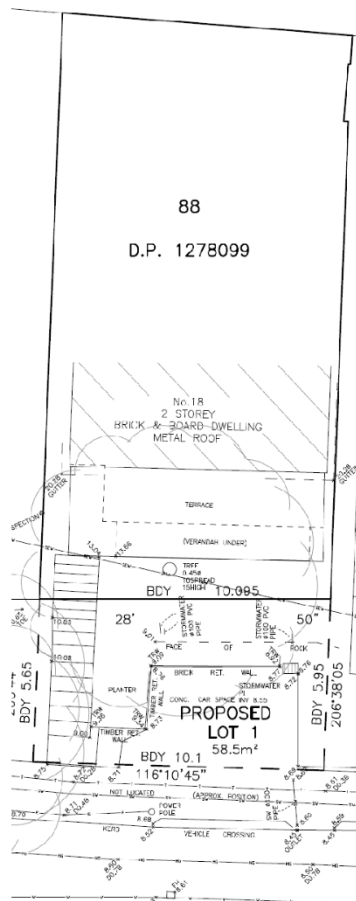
Proposed plan of subdivision by M.Y. XU & Co dated 3 May 2023
